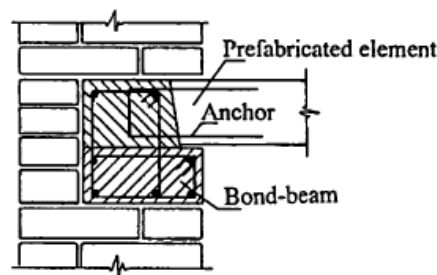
Connection between new RC bond beam and existing floor (Tomažević 1999).
